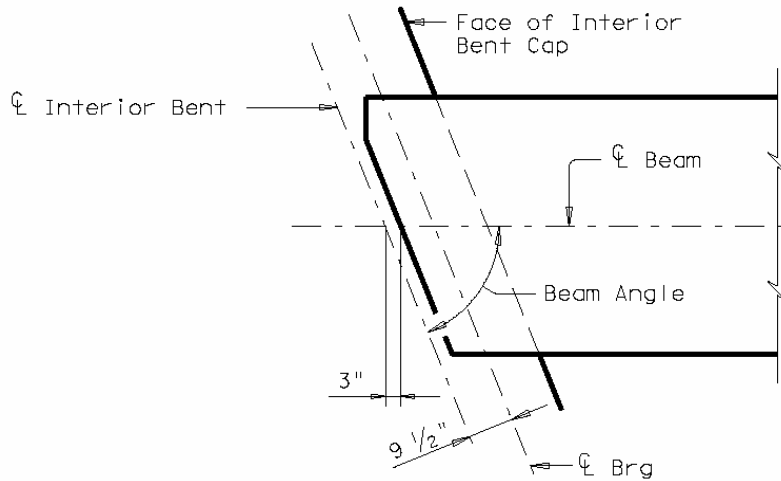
Girder End Detail for Texas U54 Girders (TxDOT 2001).
